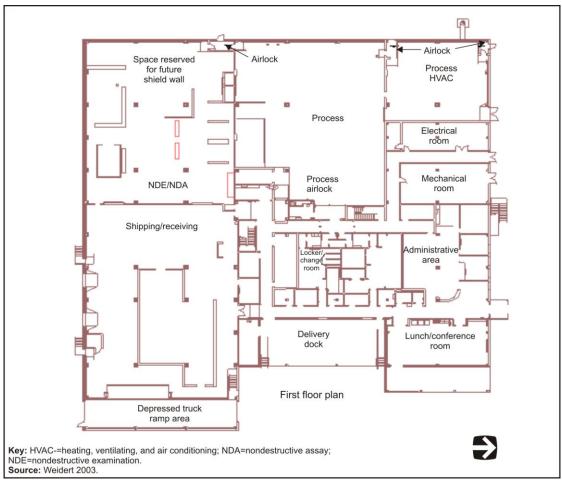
Waste Receiving and Processing Facility Structure Floor Plan
